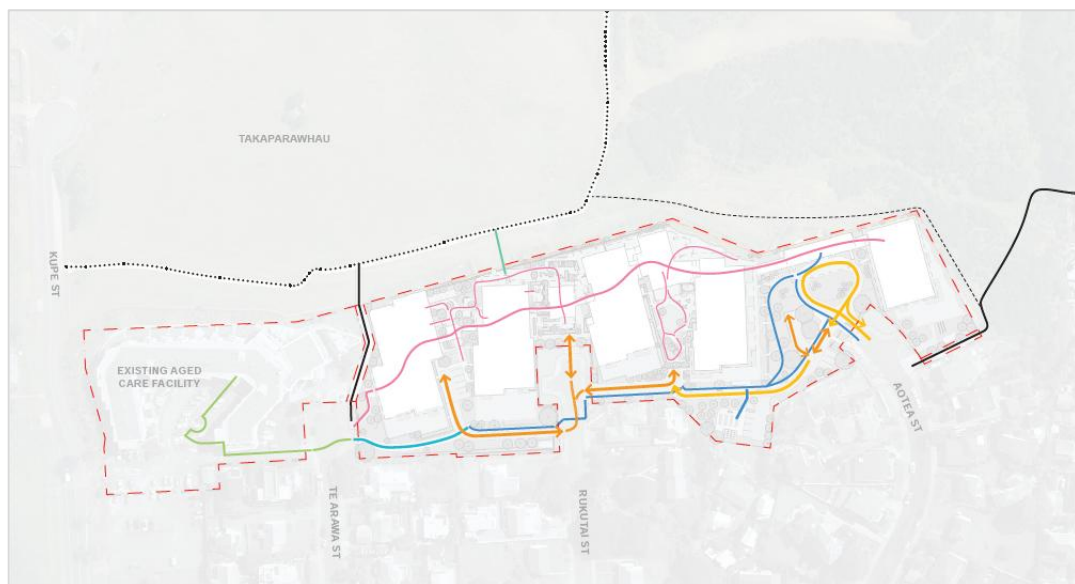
Pedestrian and vehicular circulation (Source: Sheet 23 – Landscape Plans).
